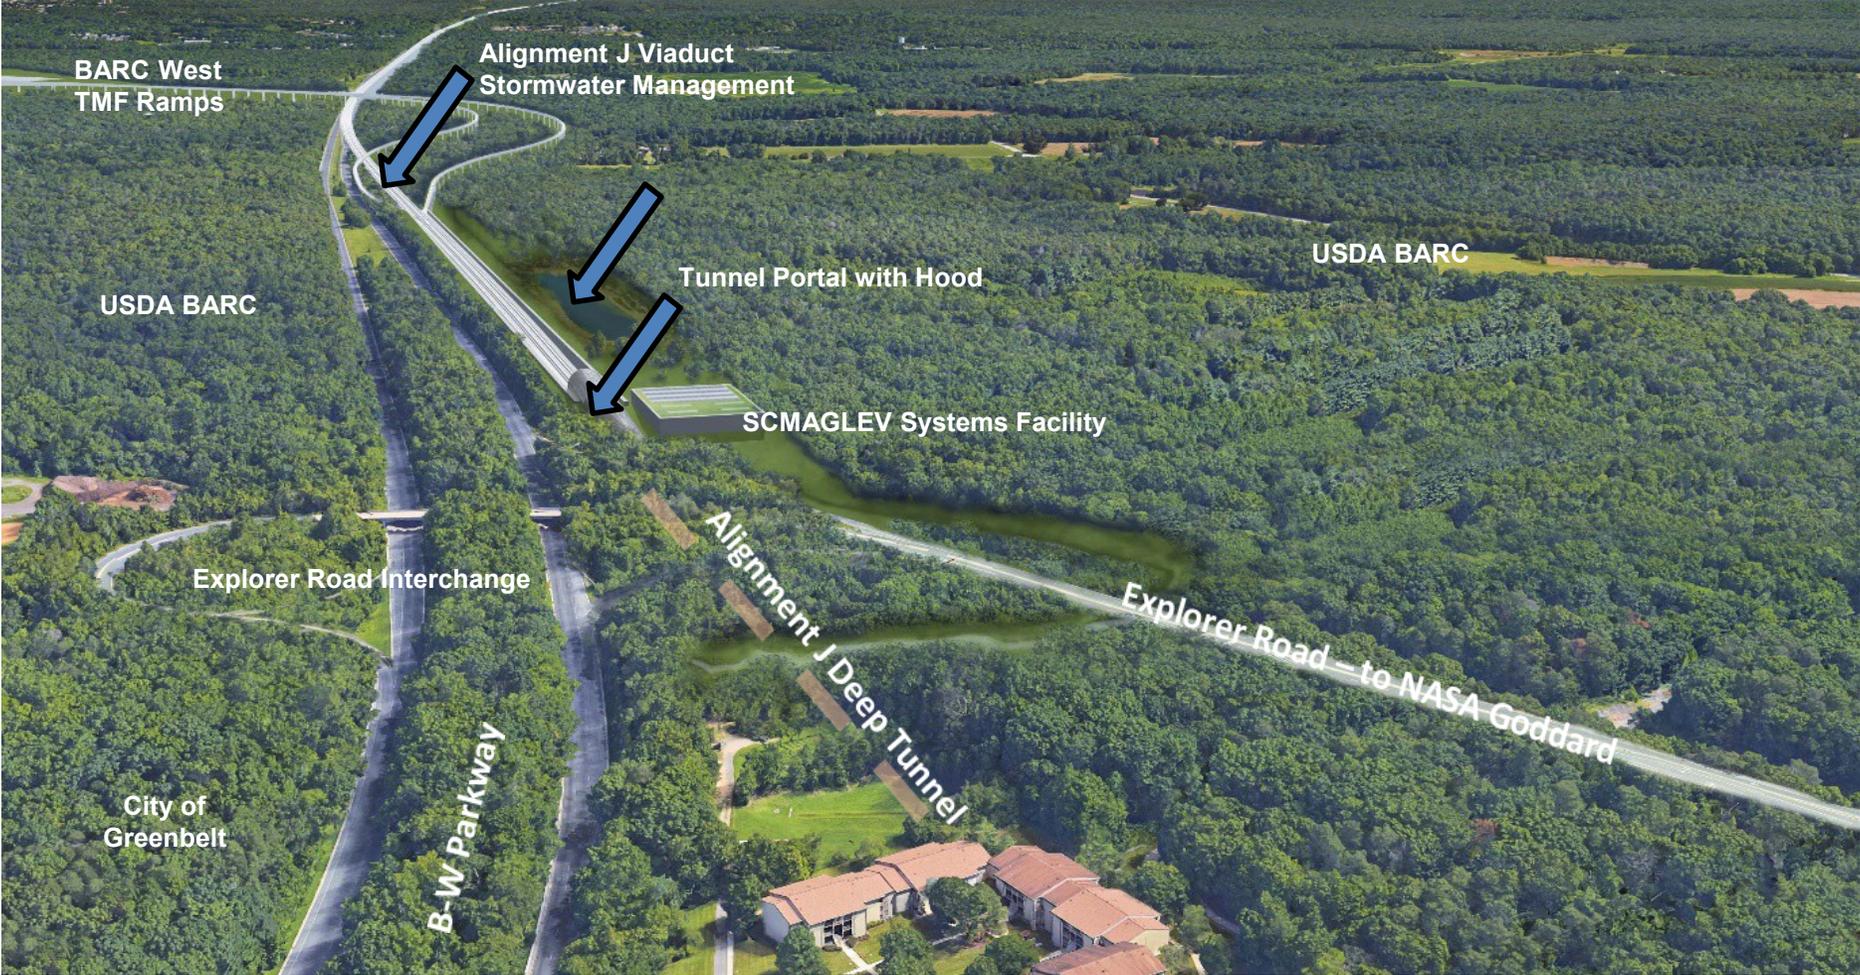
CAAs #5, #6, #7, #8, #9 - Illustrative Rendering of Alignment J Tunnel Portal at Explorer Road Interchange with Ramps to BARC West TMF, Looking North
